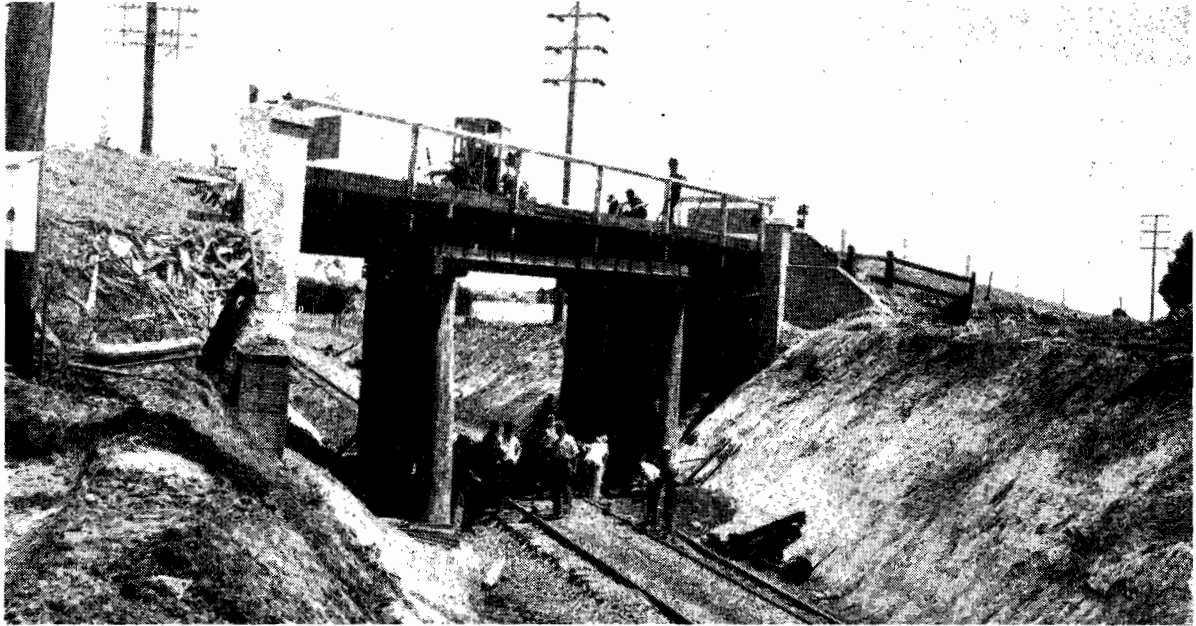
Shire of Winchelsea. Princes Highway West, Section 2. Temporary replacement of bridge over railway at Armytage.
